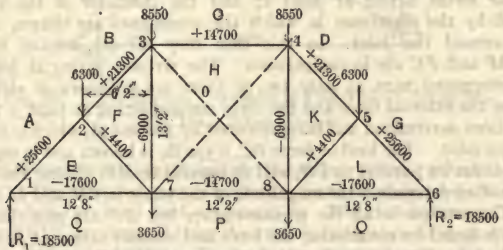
Queen Truss. Truss-diagram. (See, also, Figs. 3, 53 and 54 and Chapter XXVIII, Fig. 1)
